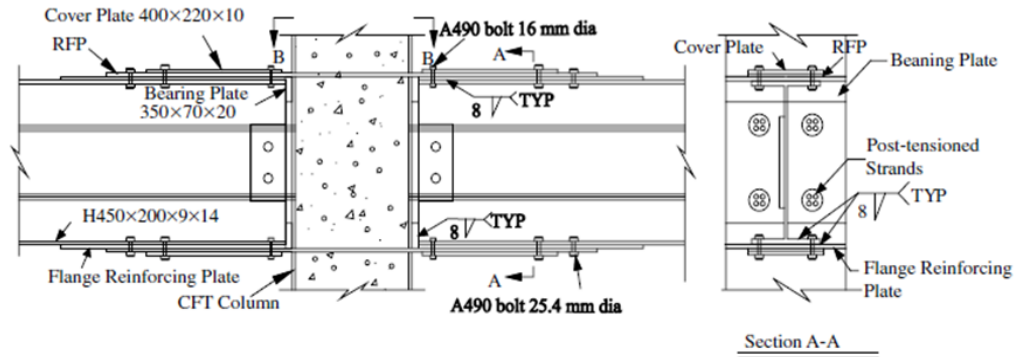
Proposed PT beam to CFT column connection (Chou et al 2006)
